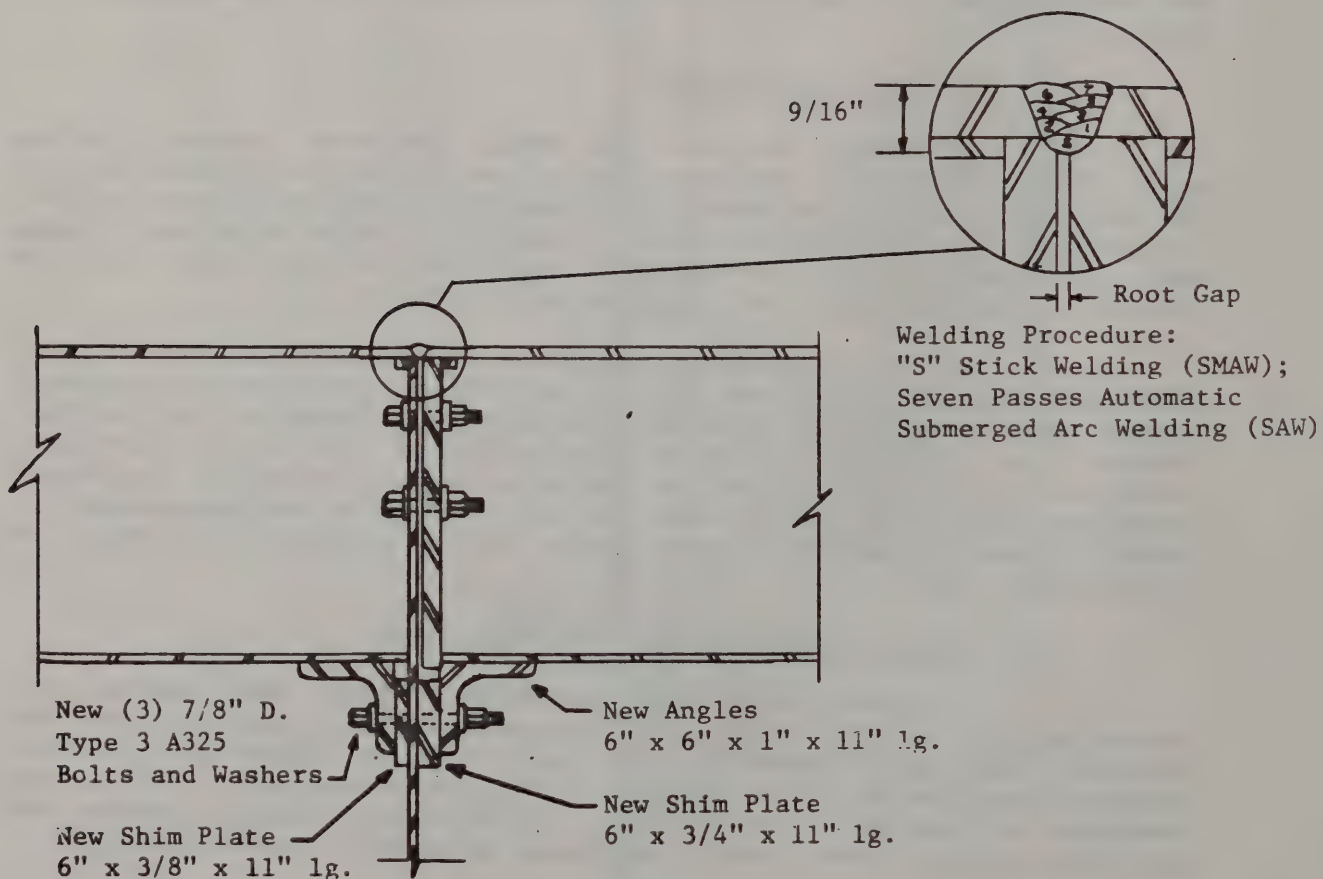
TRANSVERSE DETAIL AFTER STIFFENING
